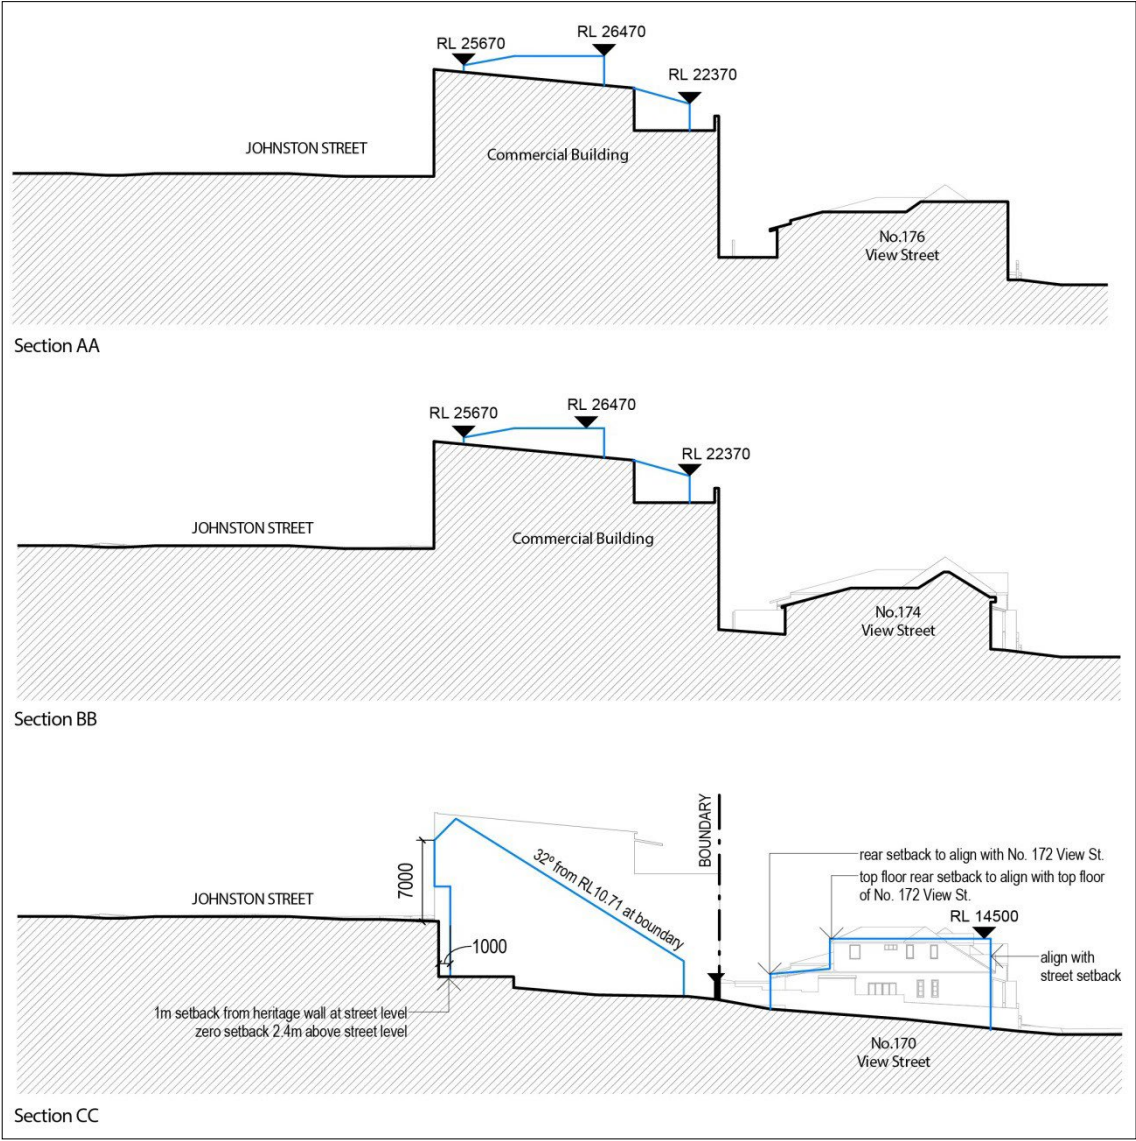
Building Heights and Massing Envelope – Section AA, Section BB & Section CC
